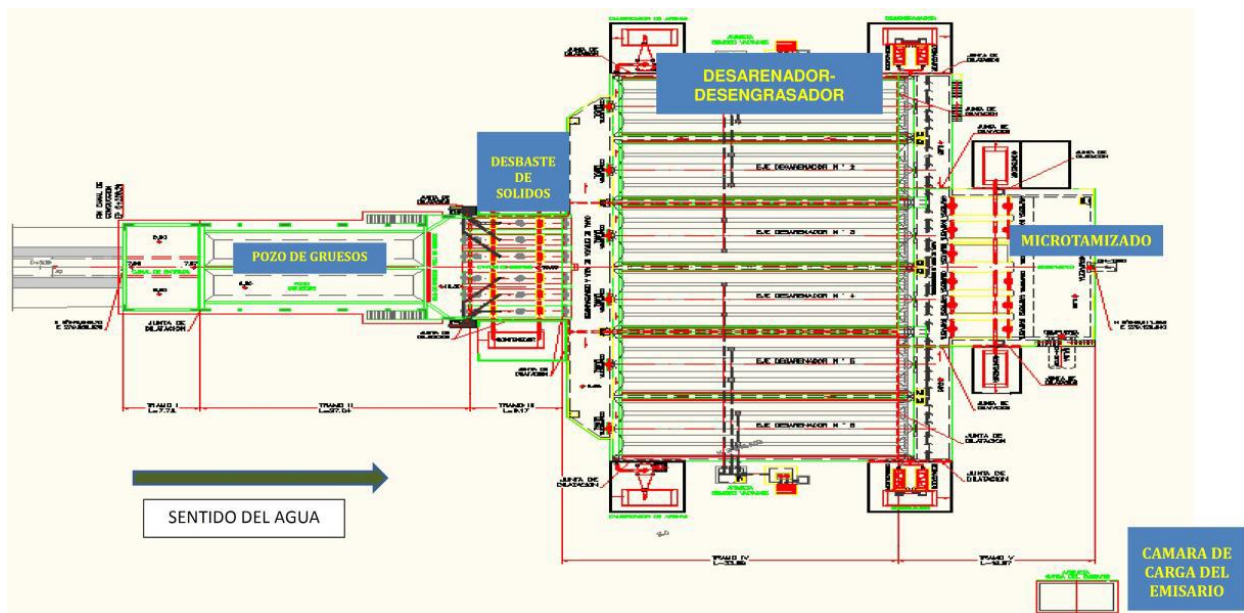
General scheme of the Wastewater Treatment Plant. Source: Engineering team of La Chira WTP. Walsh. 2011. Resumen Ejecutivo.R-9.
